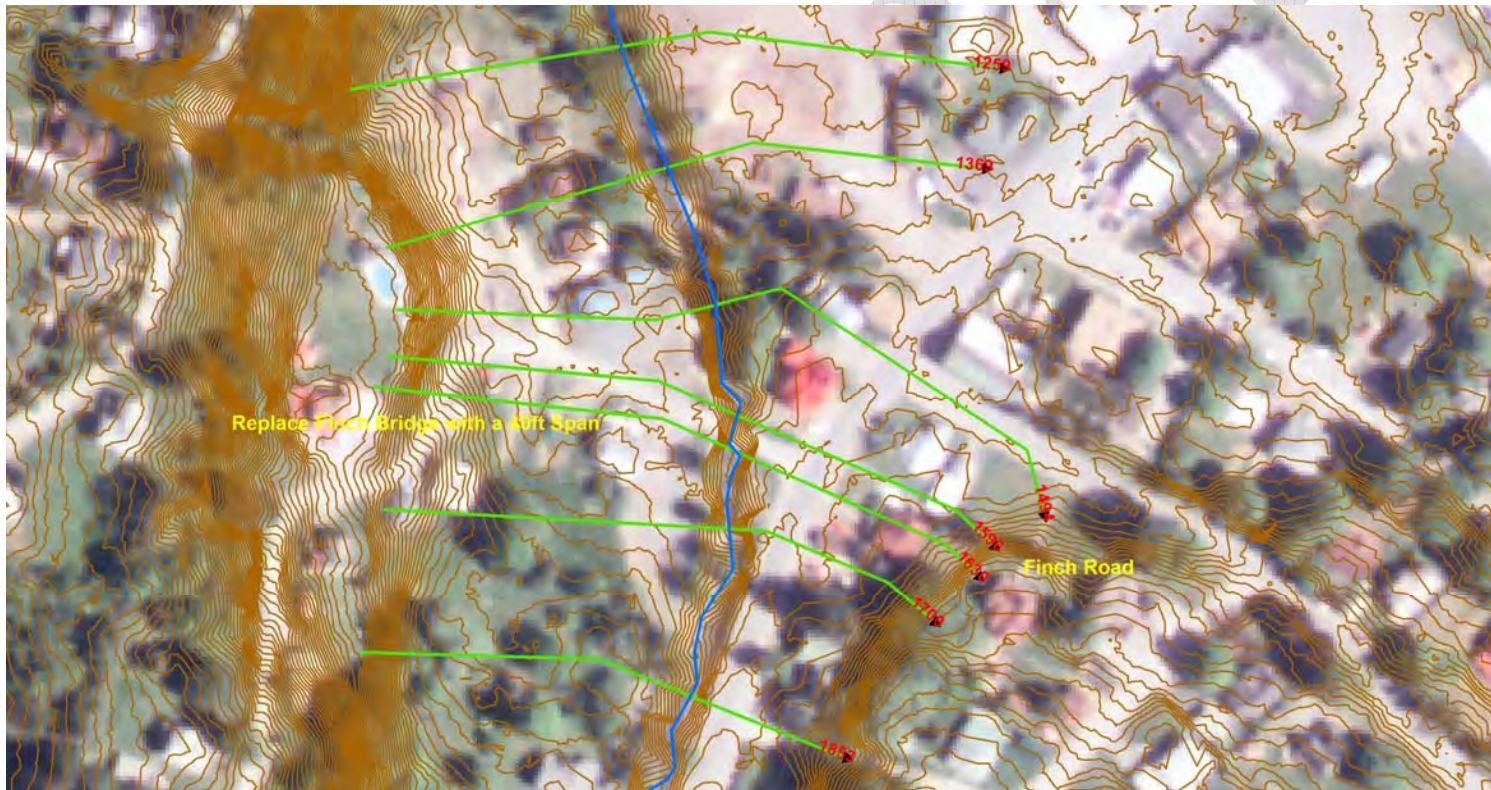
Conceptual Plan for New 40ft Wide Finch Bridge
